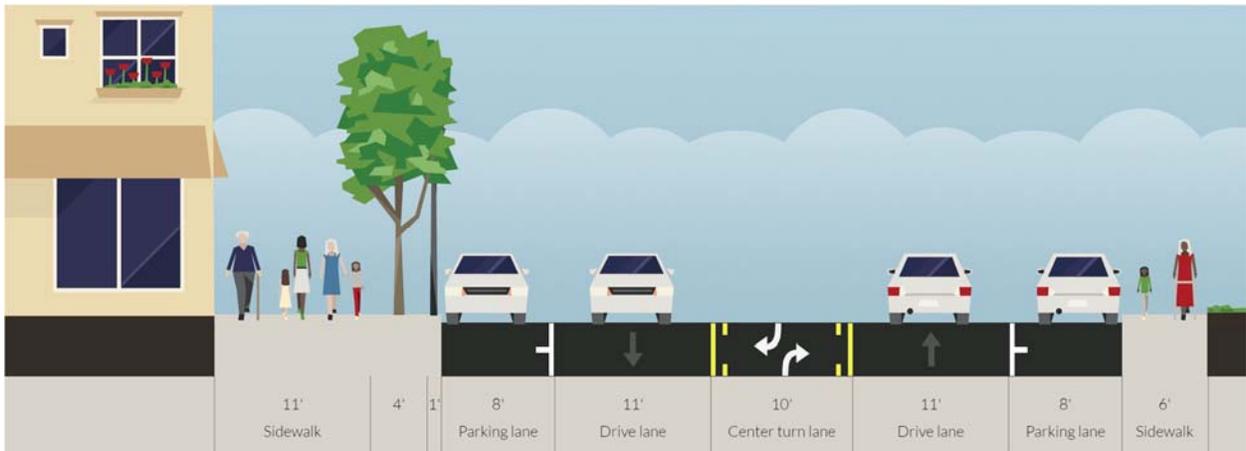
PROPOSED SECTION OF GREEN BAY ROAD (SPRUCE – ELM)
